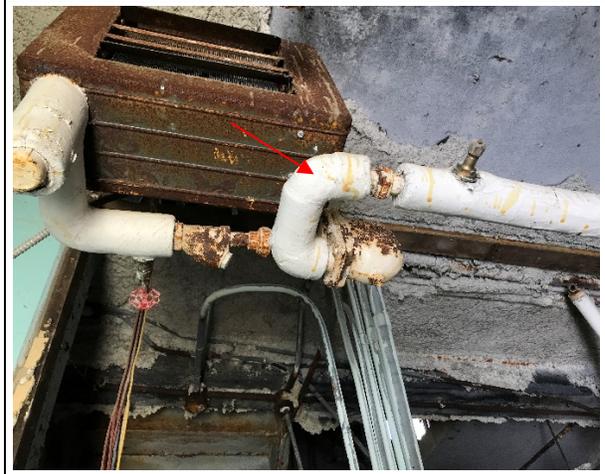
Building 3 – asbestos-containing (65% chrysotile) insulating cement on pipe fittings located in the entrance
